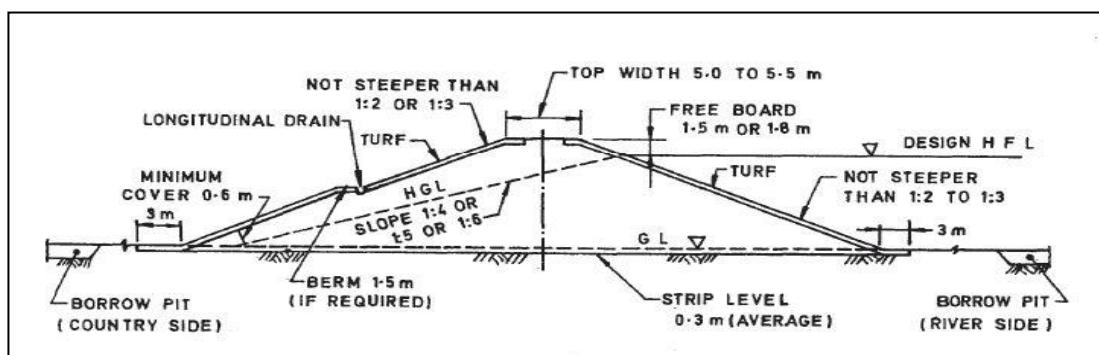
Typical Cross Section of a homogeneous Embankment
